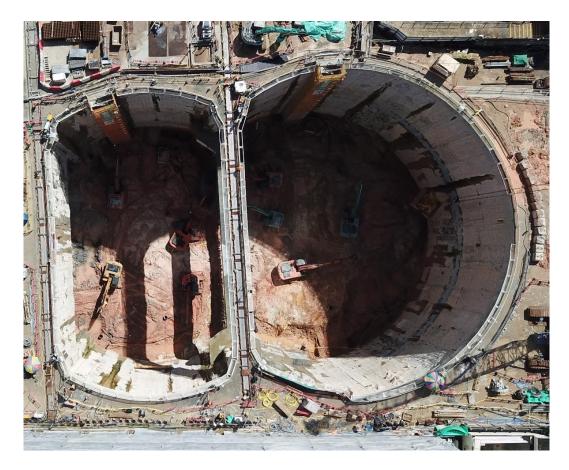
TBM Launching Peanut Shaft in Trunk Road T2 and Cha Kwo Ling Tunnel Project
